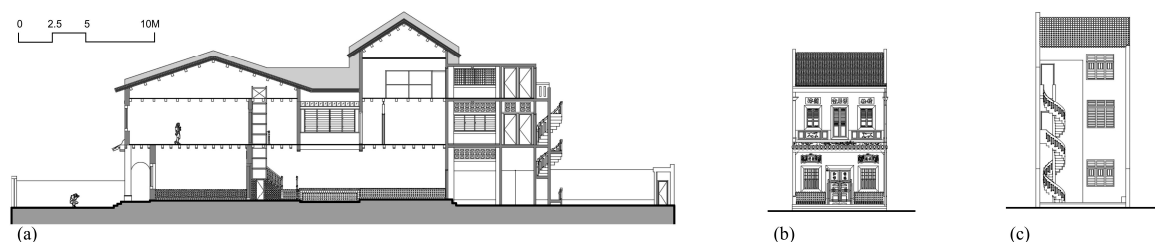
Elevation and section of 141 Neil Road: (a) section of the townhouse; (b) north elevation of the townhouse; (c) south elevation of the townhouse.
